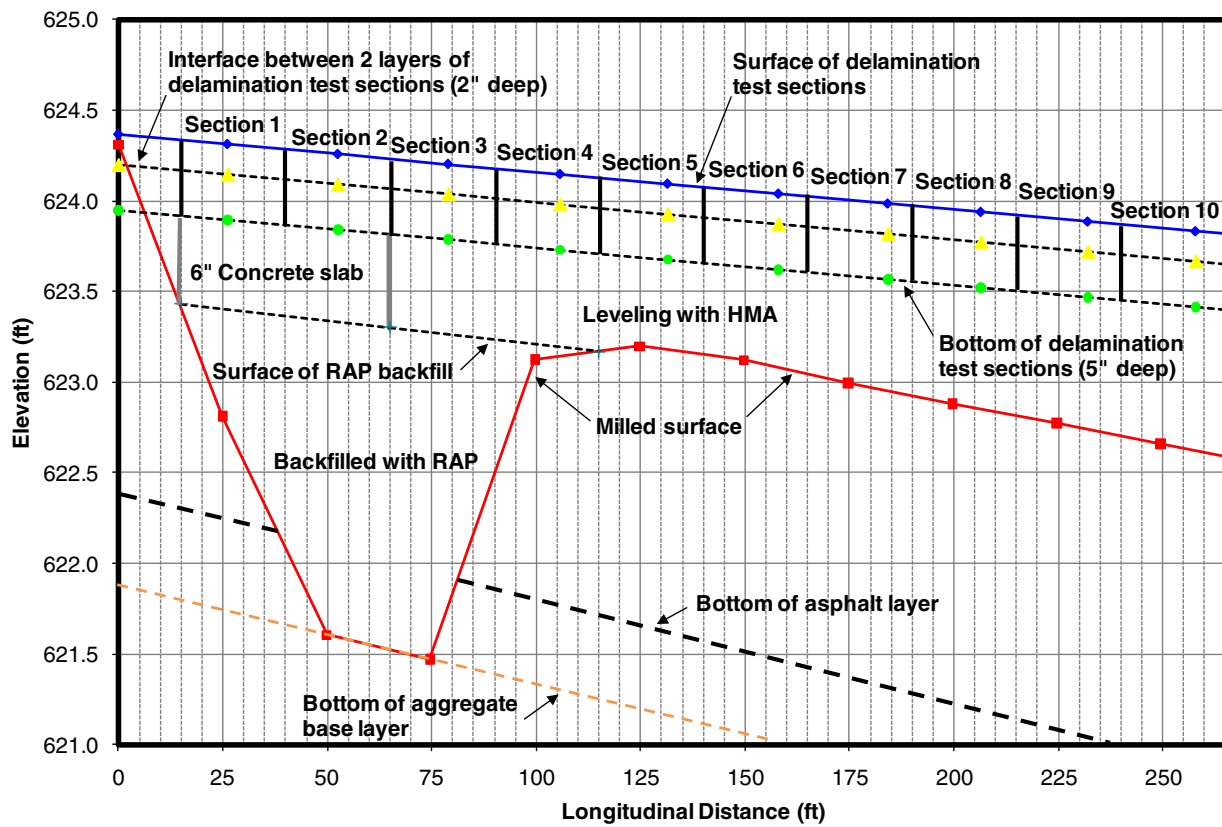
Pavement test section profile (Stations 0+00 to 2+65).
